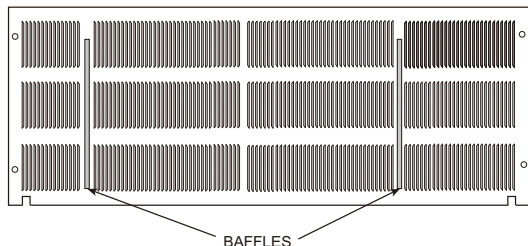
Remove Existing Outdoor Grille Baffles on Competitive Grille
